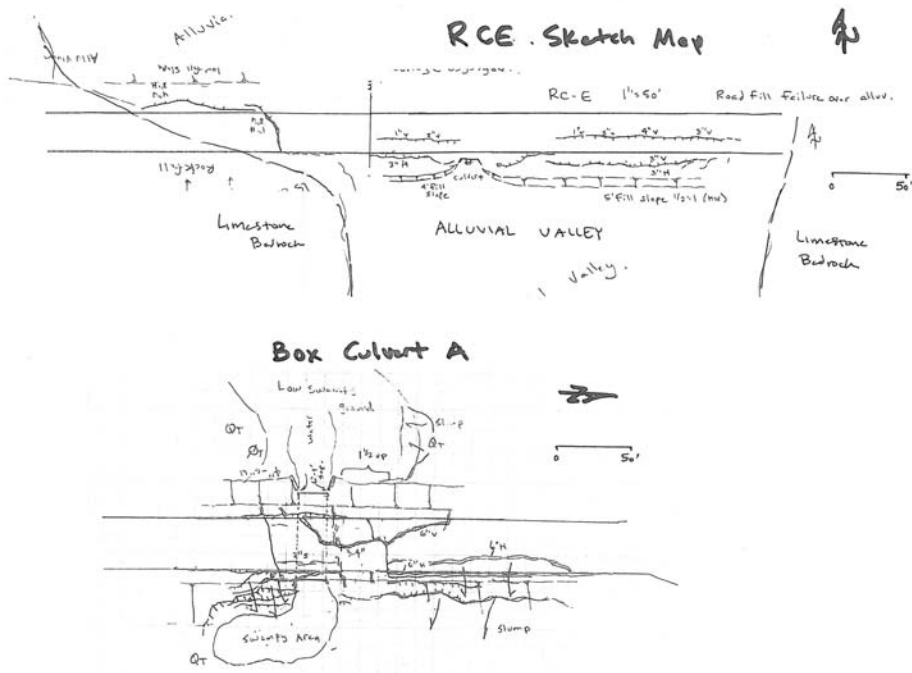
Road fill failure sketch maps for site RCE and BOXCLVTA.
